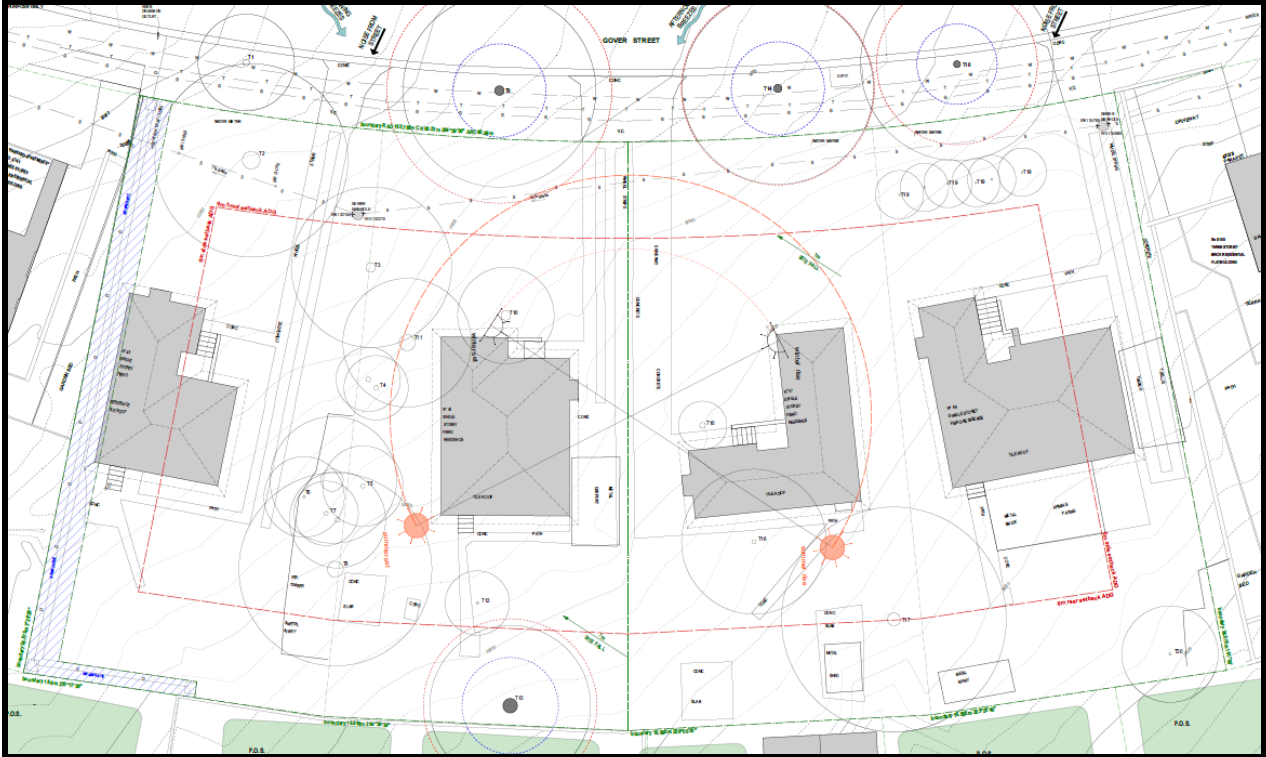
Extract from the Survey Plan of the subject site showing the configuration of properties, structures and existing vegetation
